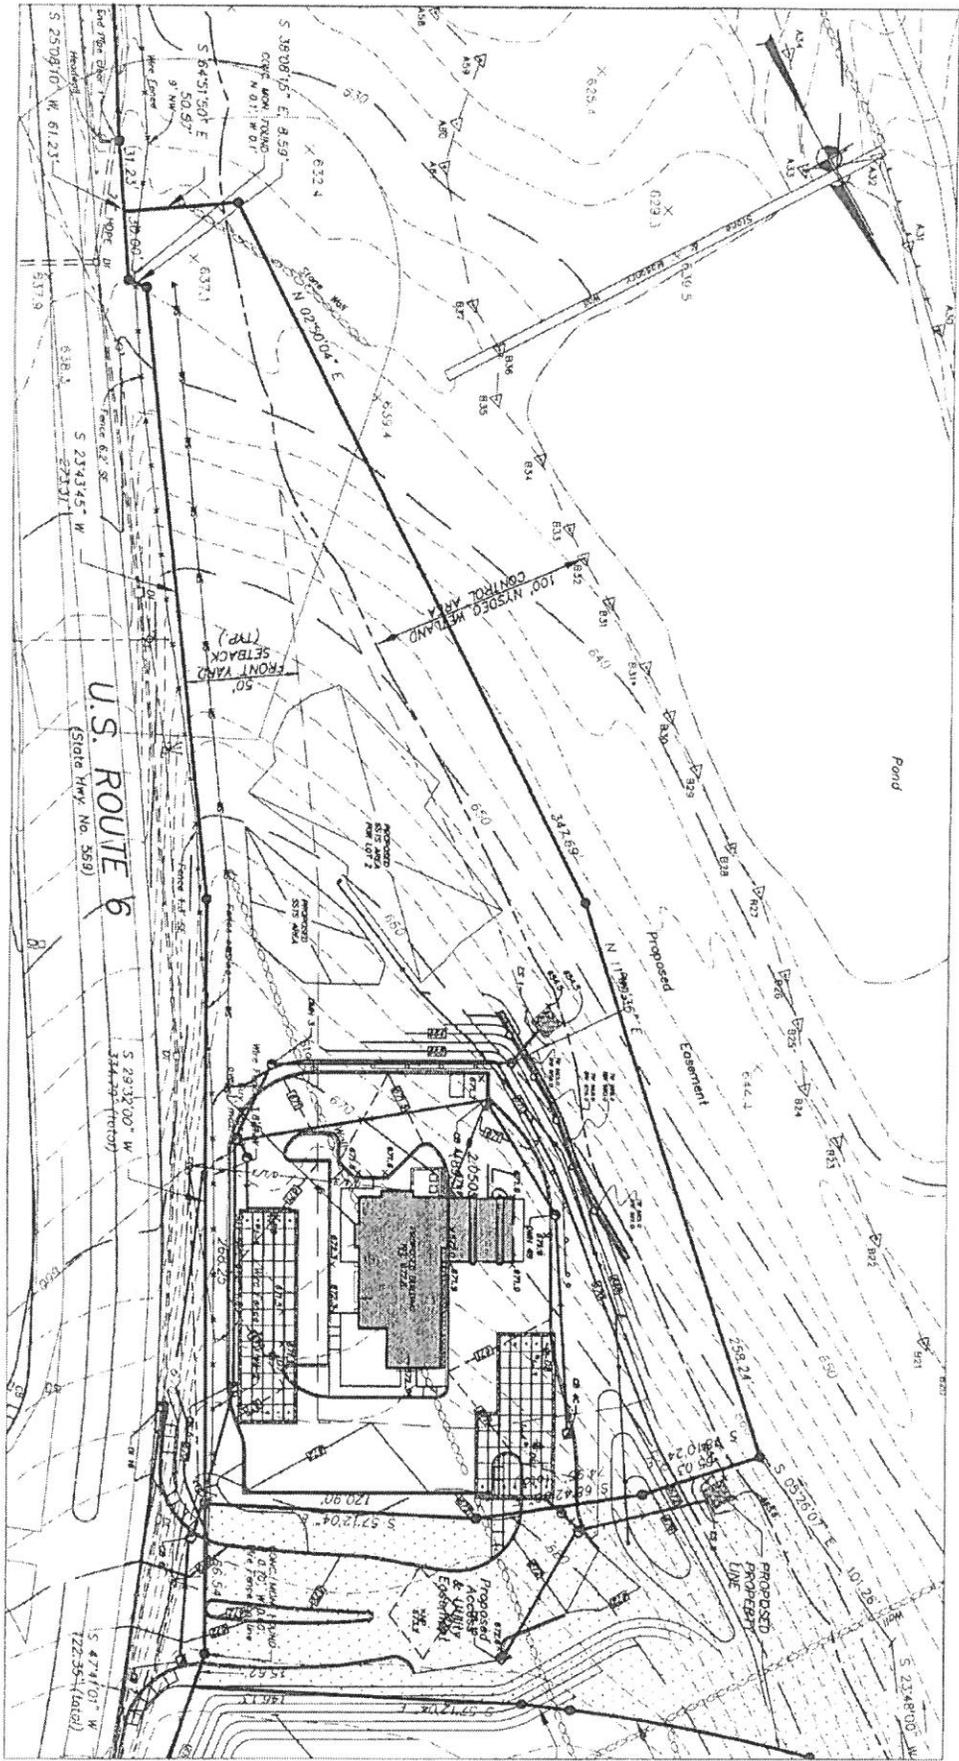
PCSB S ME PLAN ON PROPOSED 2 AC. LOT
